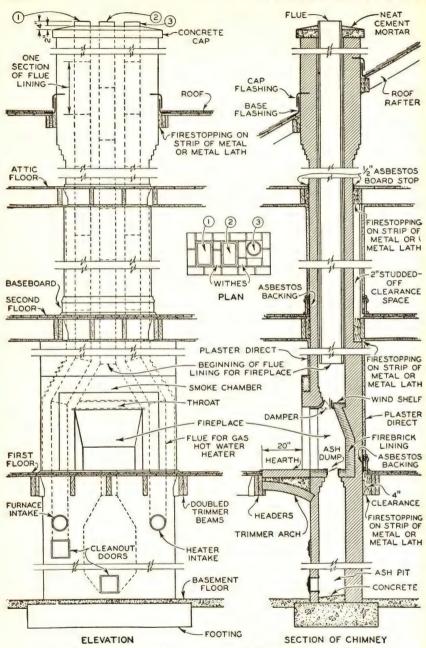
Elevation and Sectional Views of Chimney Shown in Fig. 3
